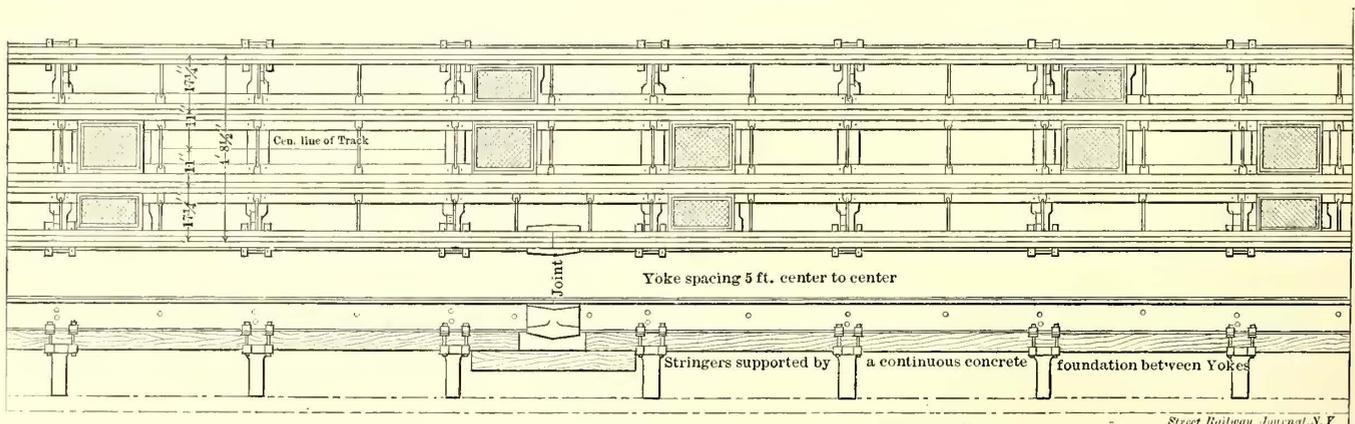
PLAN AND SIDE ELEVATION OF NEW CONSTRUCTION
